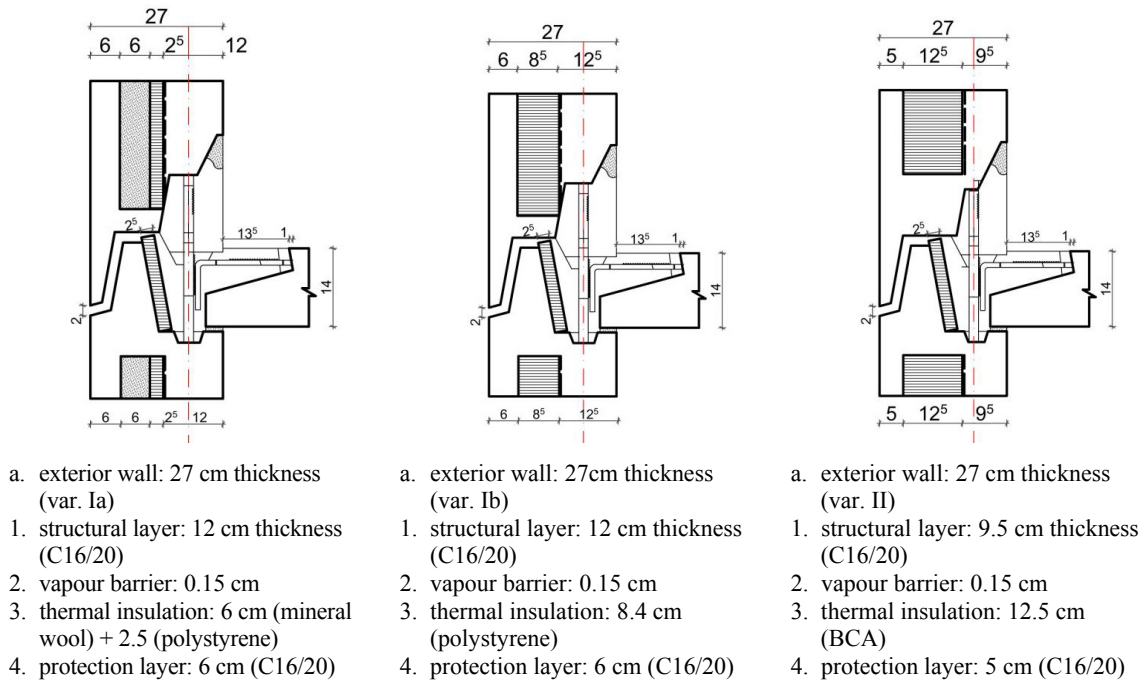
Prefabricated concrete panels for façade (770-IPCT project): details for connections and insulation
